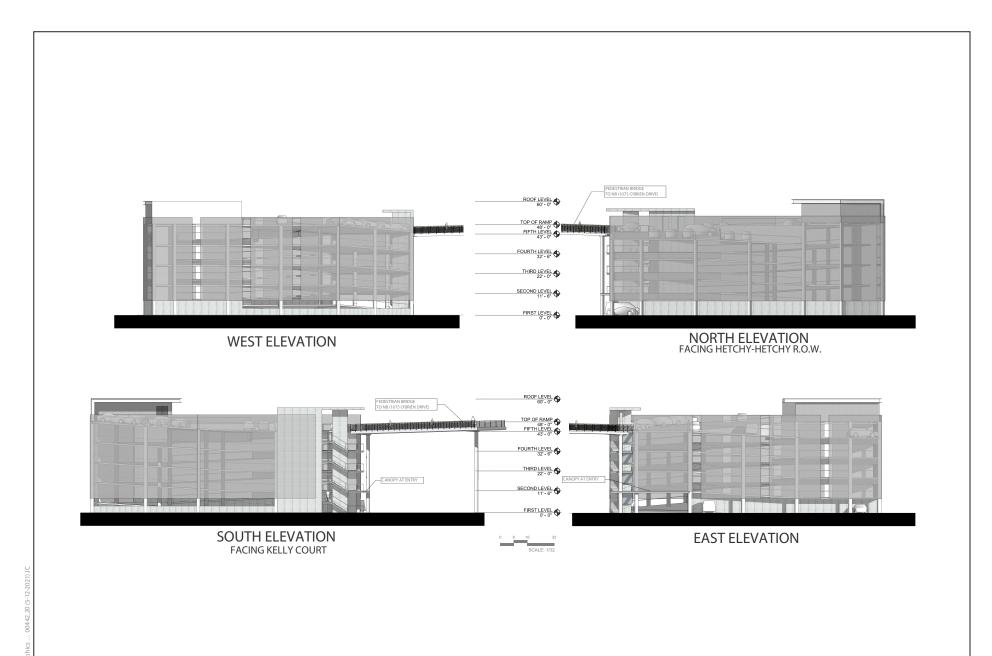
1075 O'Brien Building Elevations CSBio Phase 3 Project
